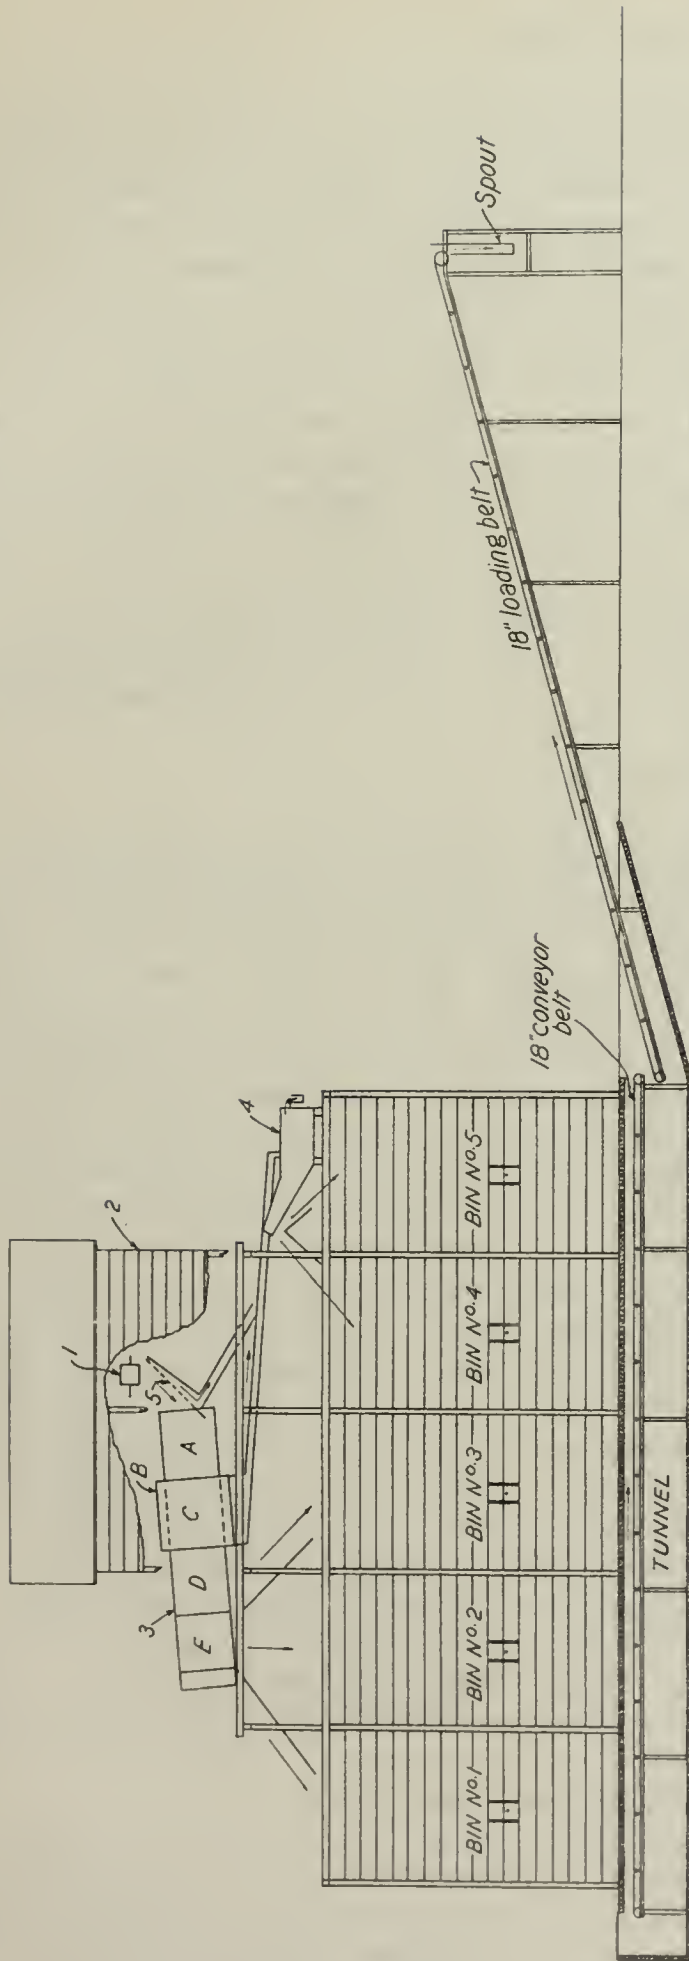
Side elevation of bins and loading conveyor belt with longitudinal section of tunnel
